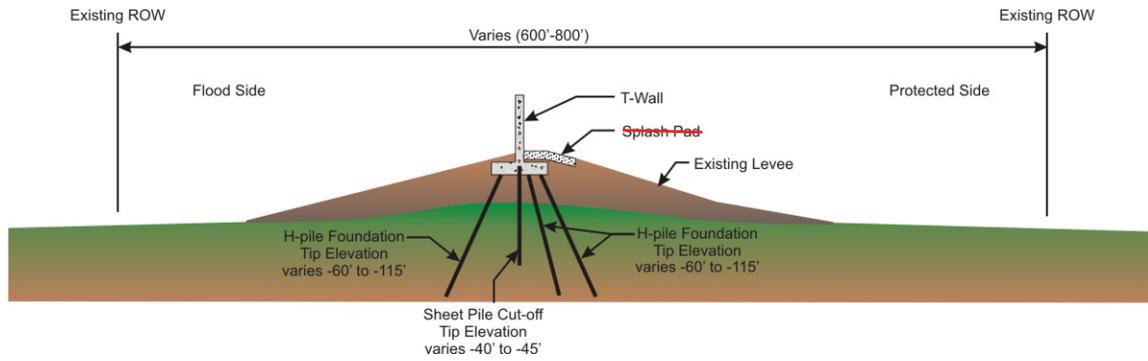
Typical Section of the Chalmette Loop T-wall constructed on the existing Levee.
